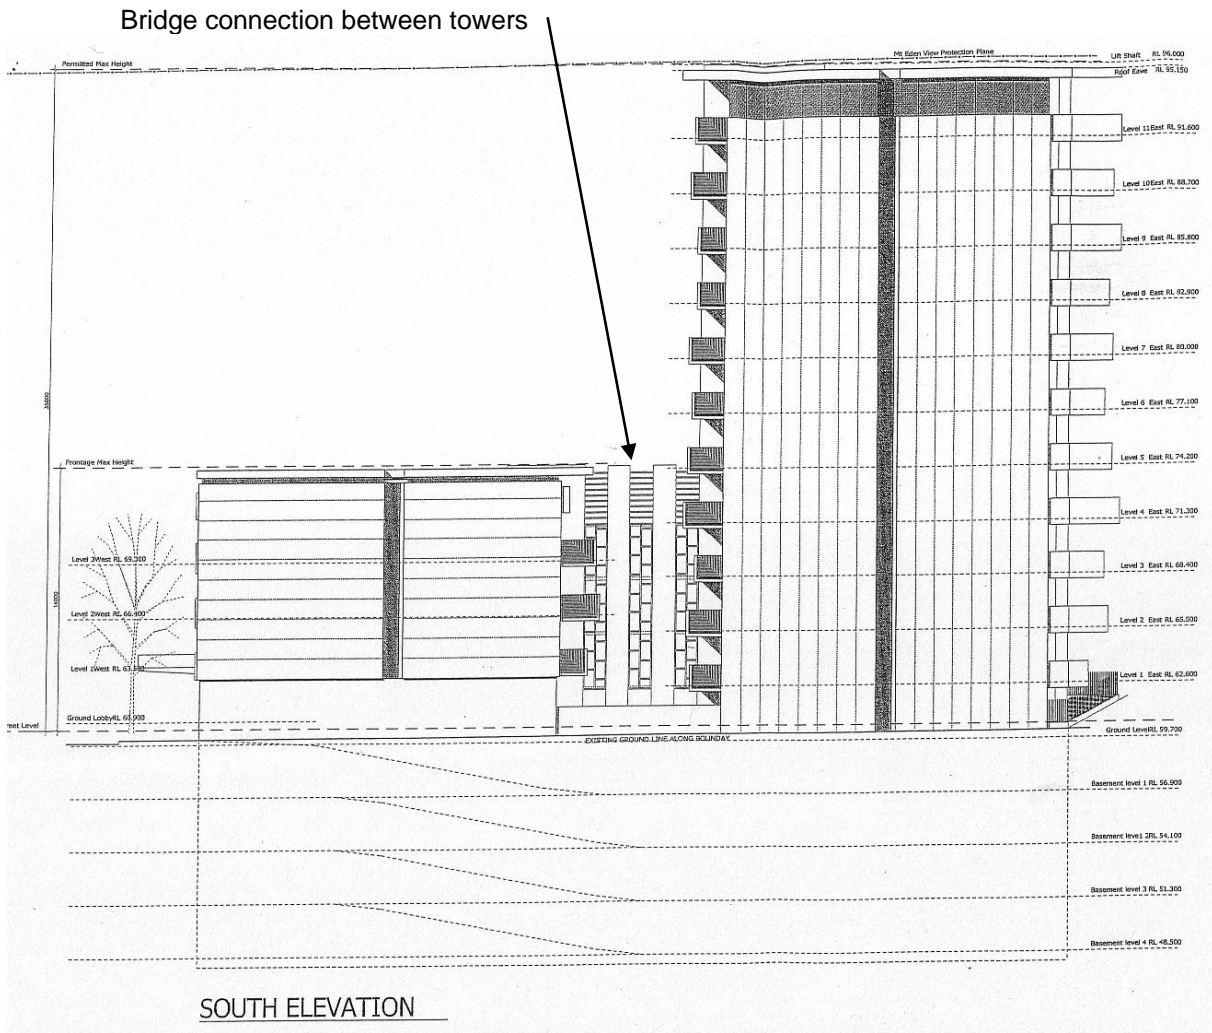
Elevations, showing East and West blocks, with the bridge between (from architects drawing No TP_10, Rev B).
